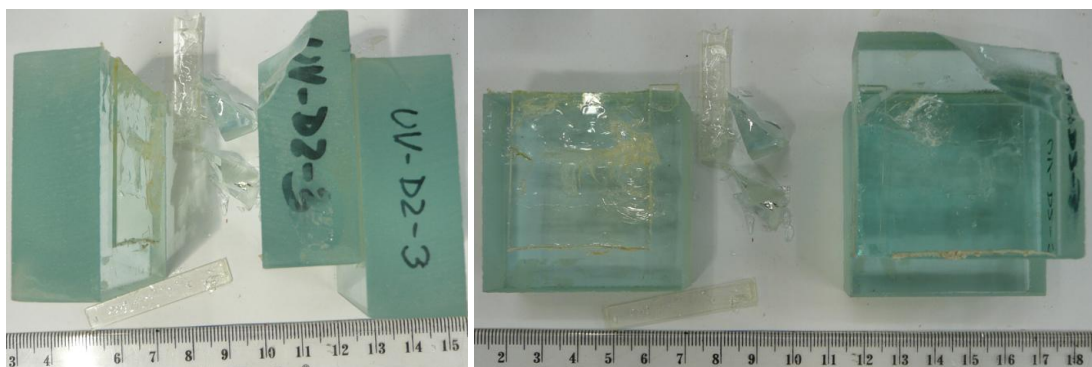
Specimen with acrylate adhesive exposed to artificial ageing after shear test - combined failure mode with dominant adhesion failure
